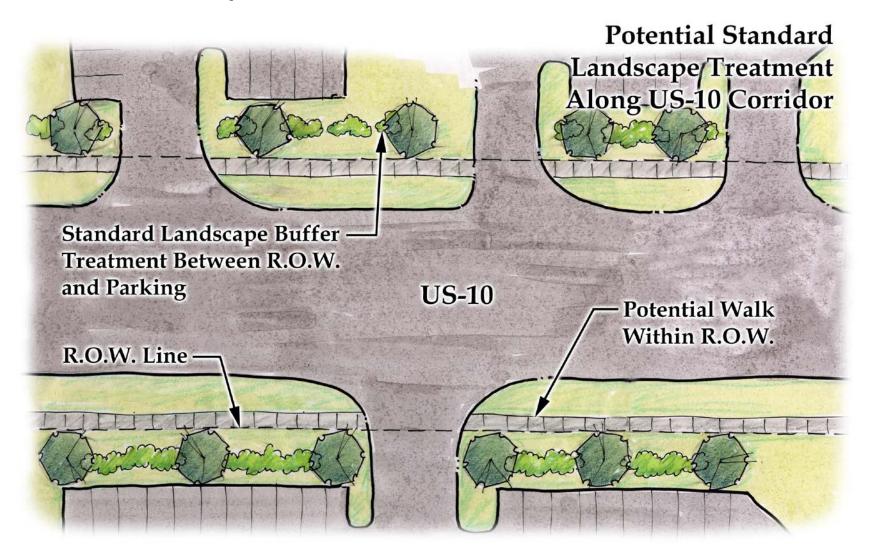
Illustration F. Potential Standard Street Tree and Streetscape Treatment
